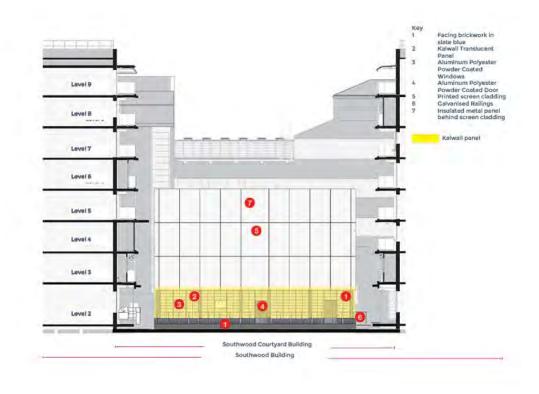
North elevation of the Southwood Courtyard Building showing the location of the Kalwall Panels edged in yellow within the context of the Southwood Building and Variety Club Building
